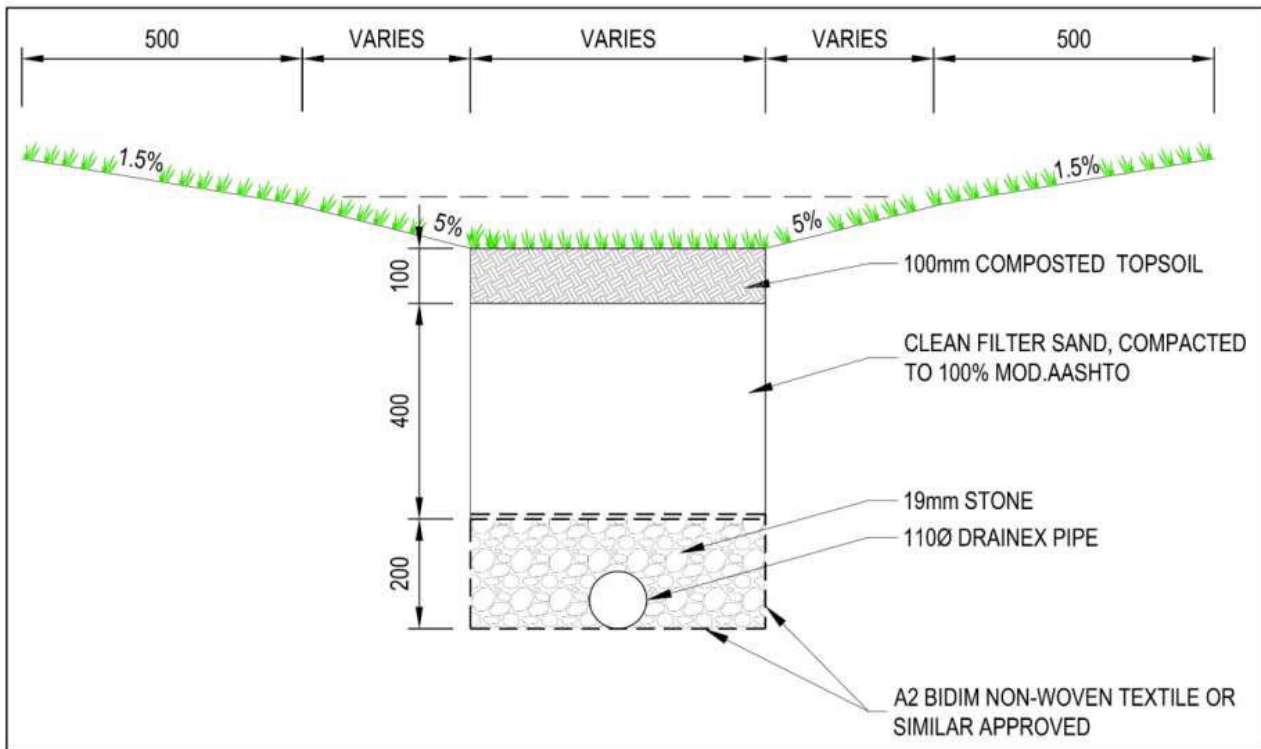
Typical Cross-Section of Dry Swale (Zutari, Concept Stormwater Management Plan, August 2024).
